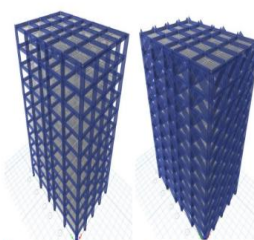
G+10 Building (Bare & Infilled Frame)
